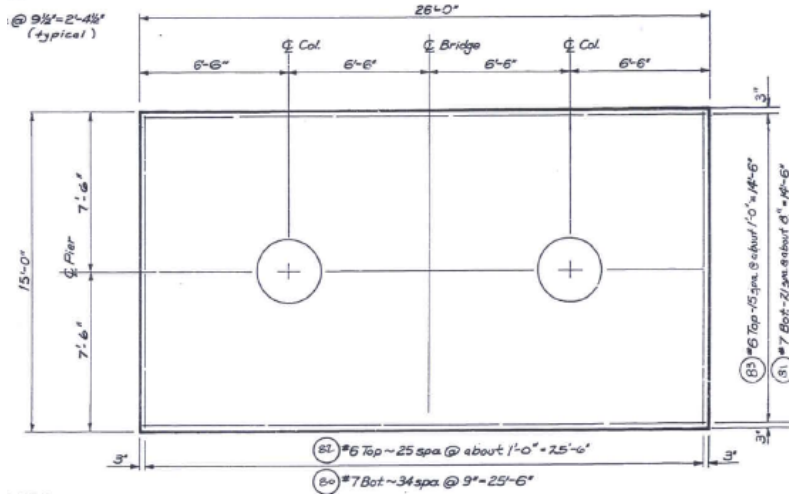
Bridge Foundation Spread Footing for Bents
